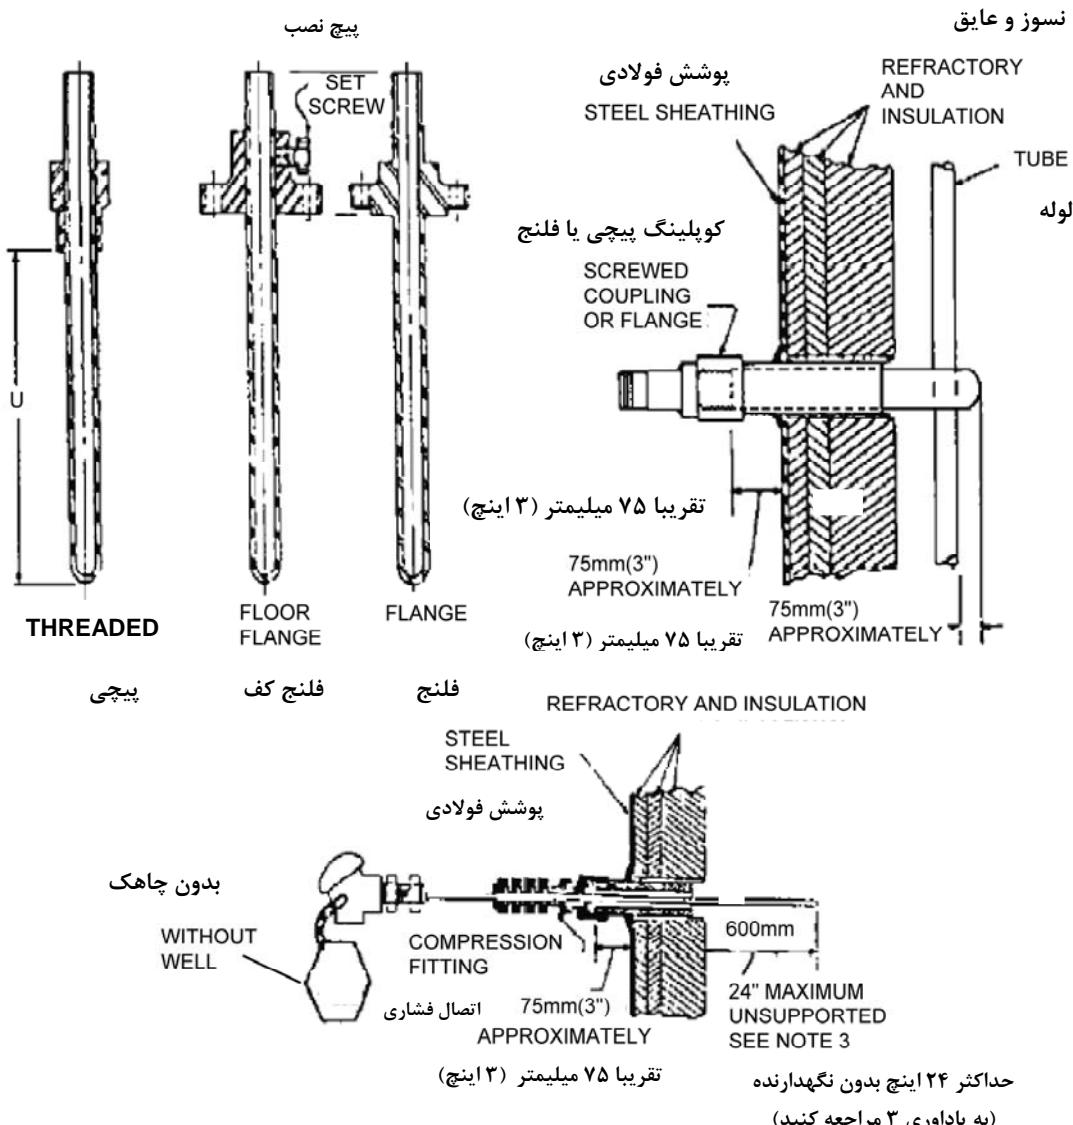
TYPICAL FIREBOX THERMOCOUPLE INSTALLATION
